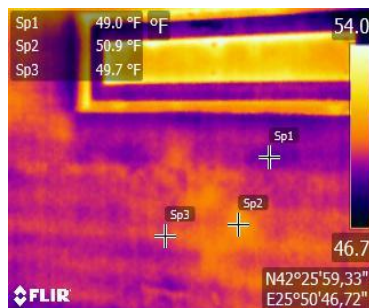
Thermal and visible image at window 2 of the building wall – envelope
